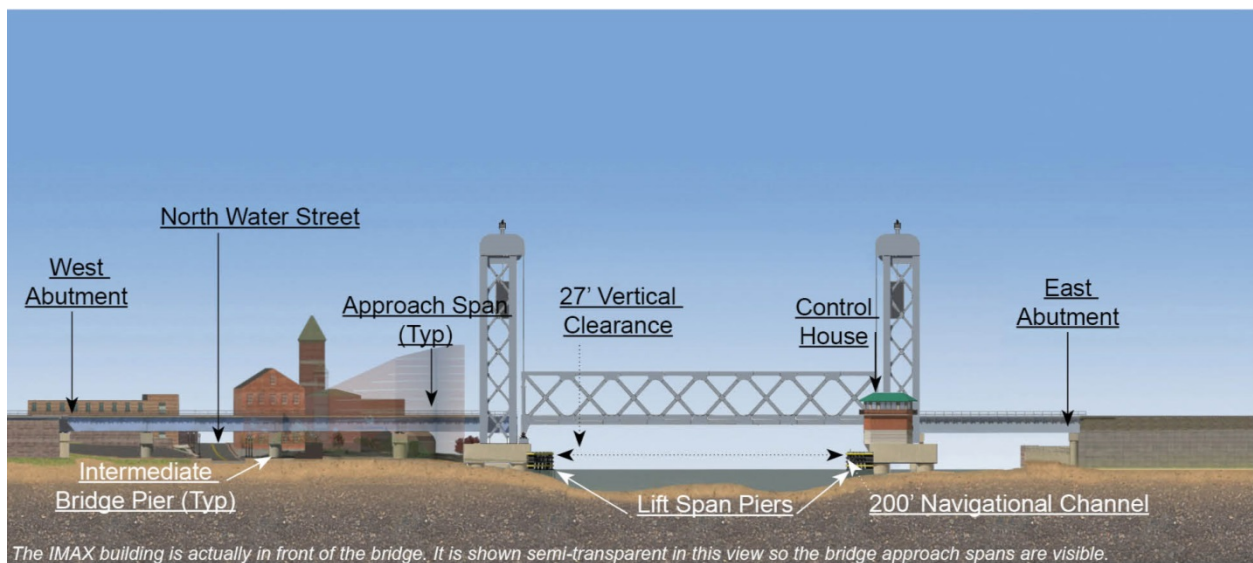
Elevation View of the Long Span Vertical Lift Bridge (Option 11C)
